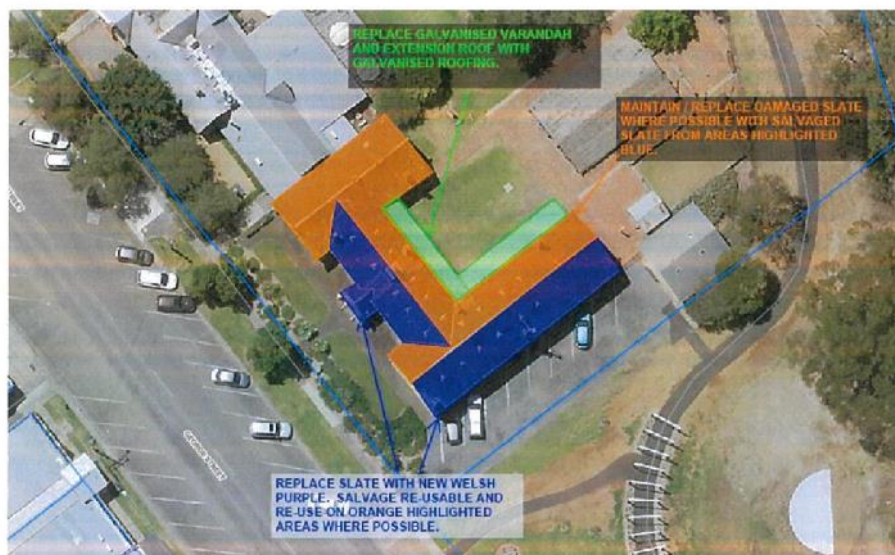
Aerial view of Peppin Heritage Centre indicating roof works
